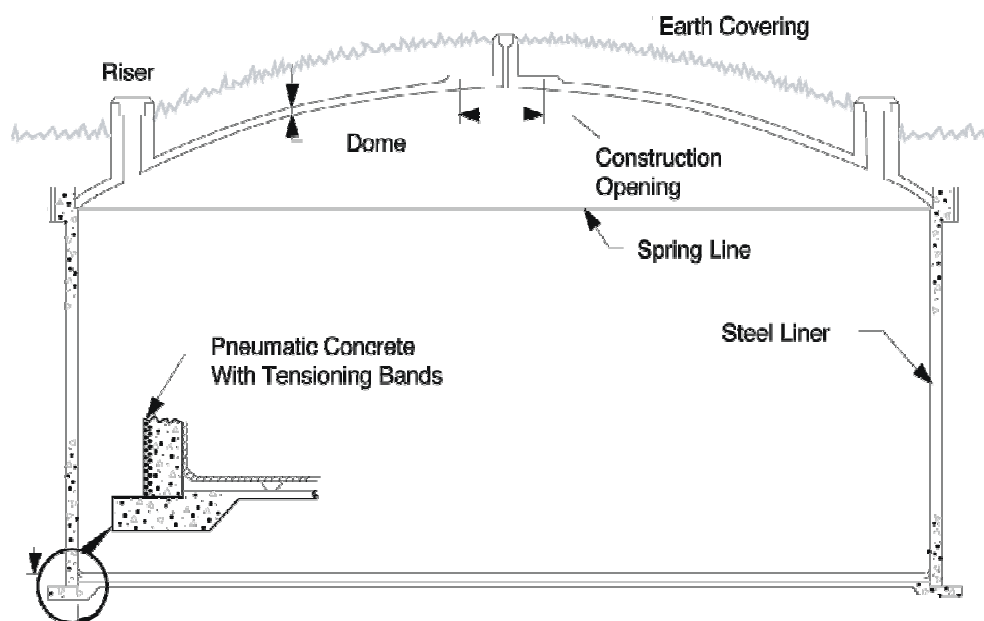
Uncooled Waste Storage Tank, Type IV (Prestressed Concrete Walls, 1,300,000 Gallons).
